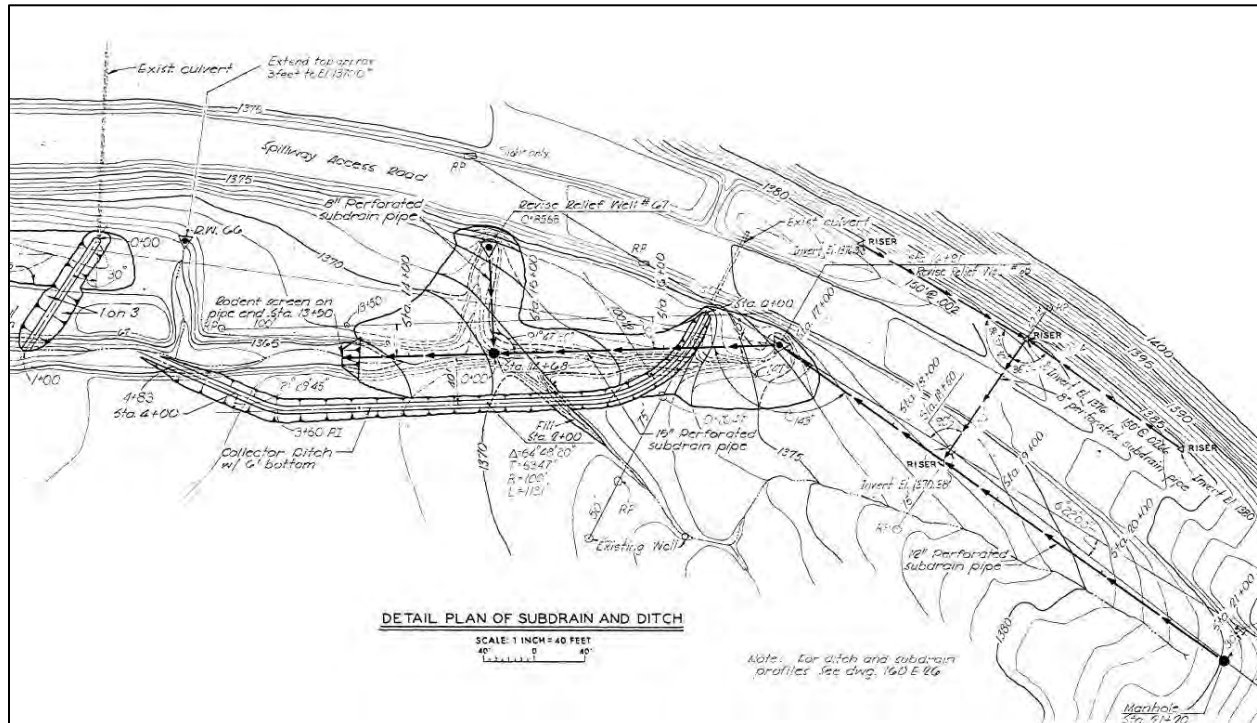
Plan view of toe drain and left abutment relief well collector subdrain system
